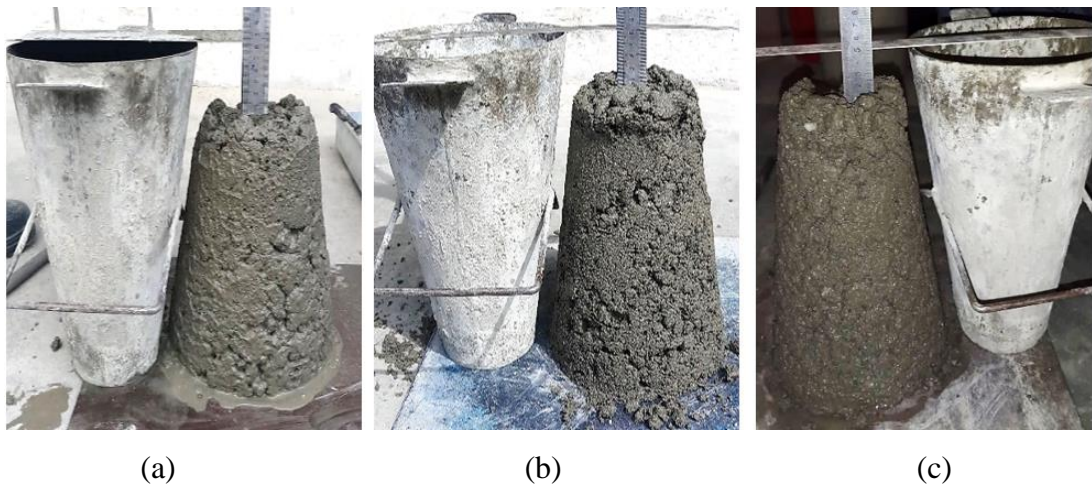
Slump Test on Fresh Concrete Properties: (a) Slump Test of Plain Concrete; (b) Slump Test of 0.6 % Steel Fibre Addition in Concrete; and (c) Slump Test of 0.7 % Steel Fibre Addition in Concrete
